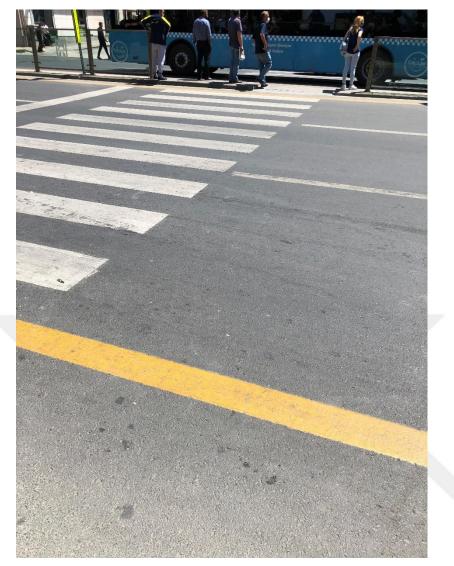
Sample pavement marking in Atatürk Boulevard
